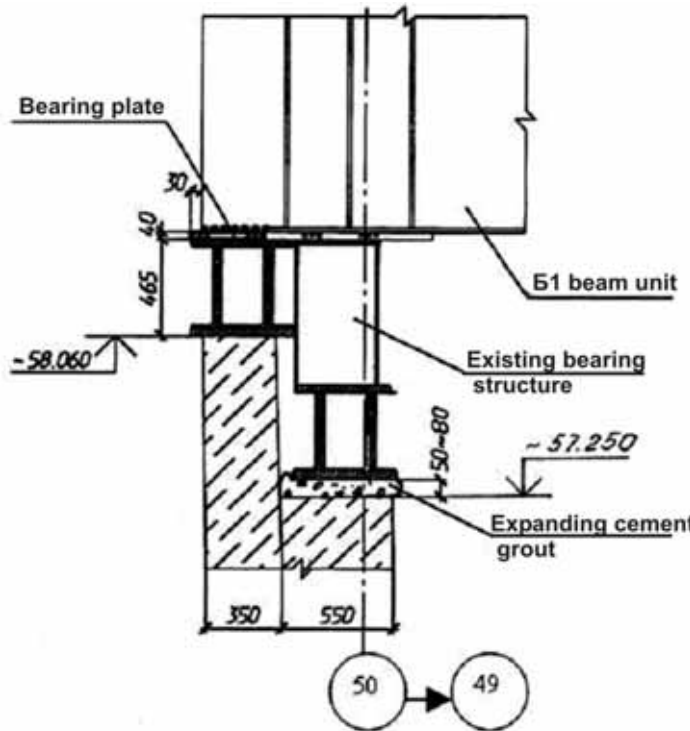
Strengthening of B1 beams supporting parts and metallic support under B1 beams in place of B1 beams unit abutting on ferroconcrete wall along axis 50 (row II)
